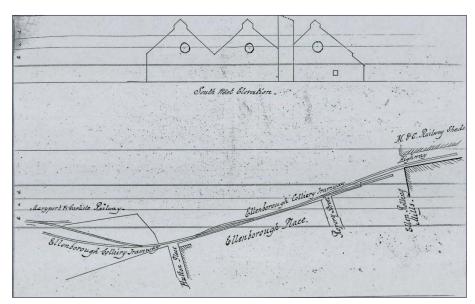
Plan showing the location of the rolling mills of Ellen Steelworks off Ellenborough Place
